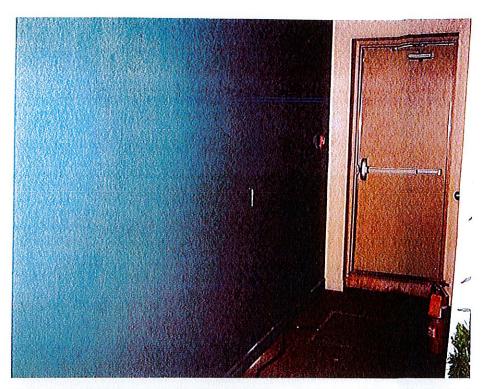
Location of samples S7, S8 and S9 (drywall in basement) for asbestos testing. This material did not contain asbestos.
